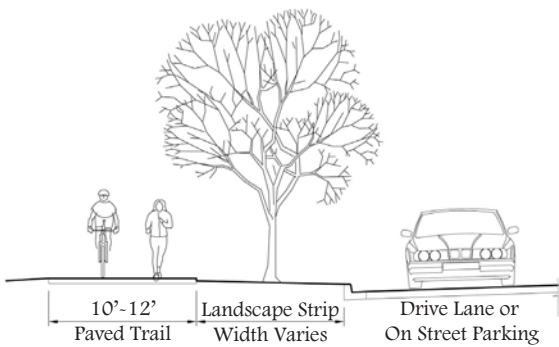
Roadside Greenway Trail/ Sidewalk
